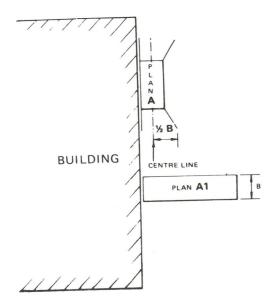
TOWER AGAINST BUILDING OR WALL WHICH IS AT LEAST TWO THIRDS OF MAX. PLATFORM HEIGHT
